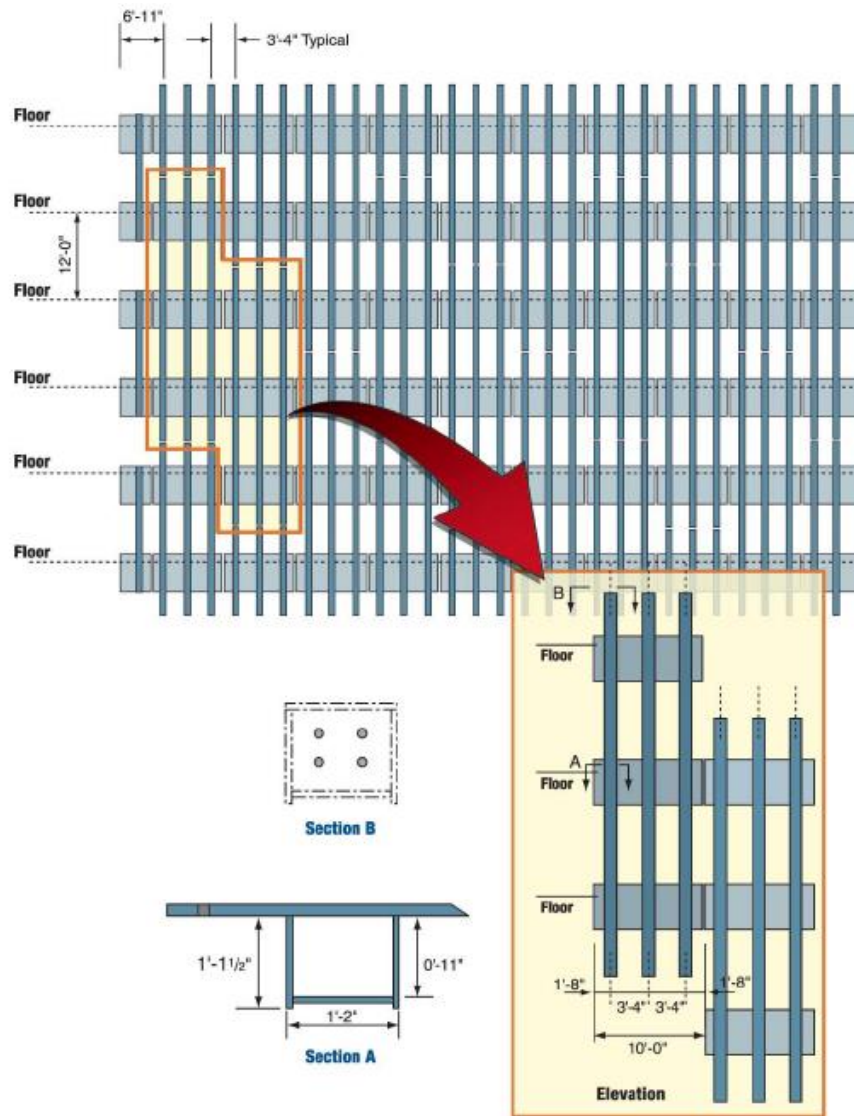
Partial Elevation of Exterior Bearing Wall Frame Showing Exterior Wall Module Construction (FEMA, 2002)
